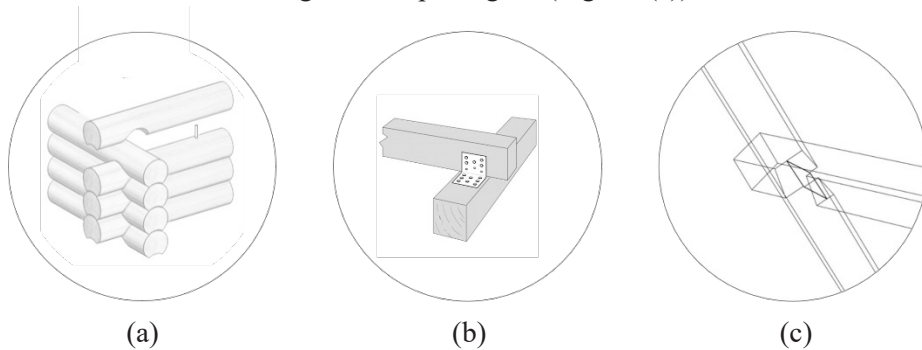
(a) Vernacular log joint (b) Timber beam connection via steel plates and fasteners (c) Interlocking non-planar joinery
